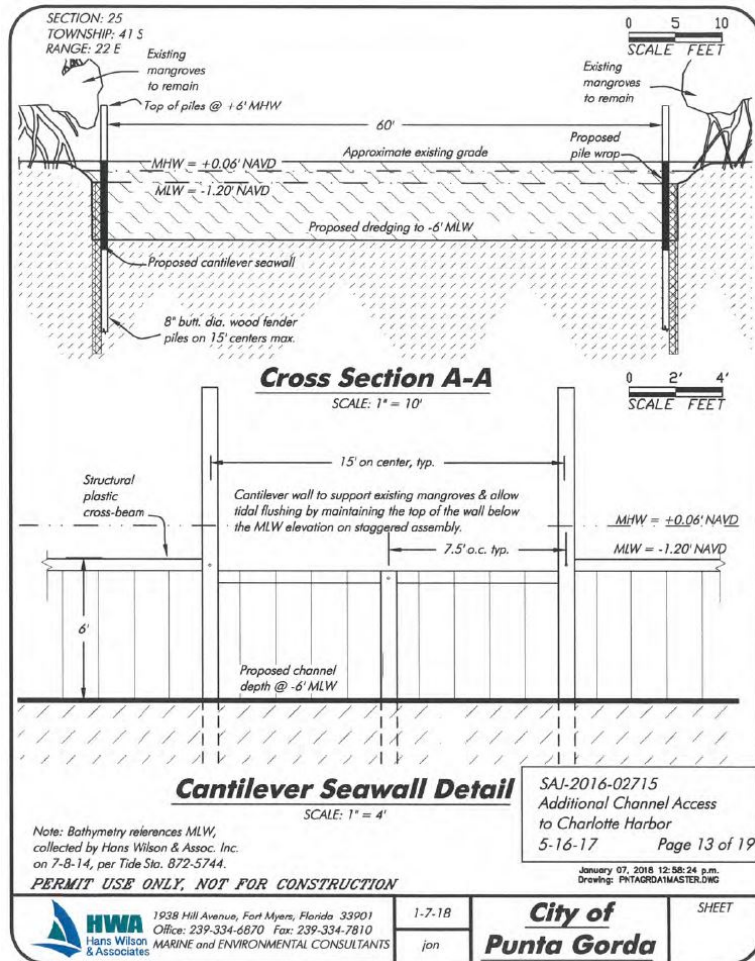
Top: Cross section of A-A in Figure 2 above, showing the cantilever seawall shoreline stabilization in the proposed channel cut. Bottom: Cantilever seawall detail (Image supplied by USACE).
